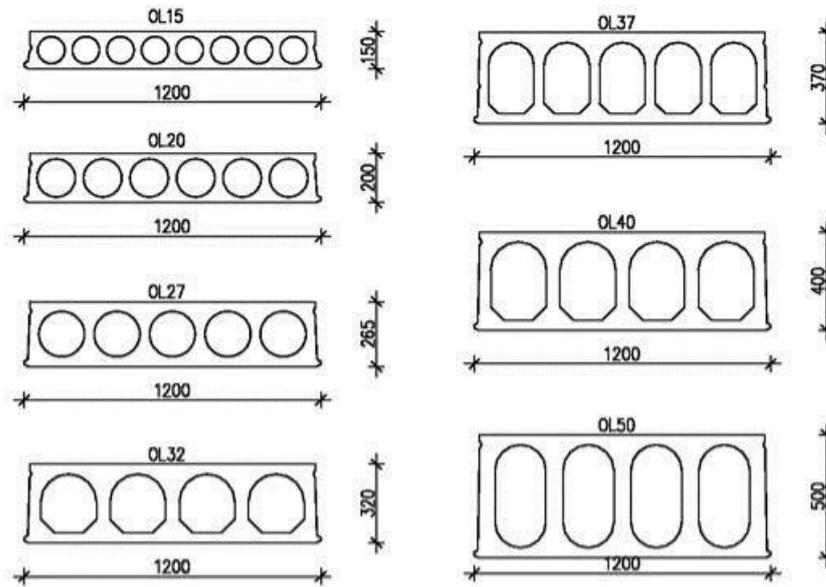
Typical dimensions ([http://www.elementtisuunnittelu.fi/fi/Haku?term=WQ,DO331: Ontelolaatan liitos WQ-palkkiin \(keskipalkki\)](http://www.elementtisuunnittelu.fi/fi/Haku?term=WQ,DO331:Ontelolaatan%20liitos%20WQ-palkkiin%20(keskipalkki)))
